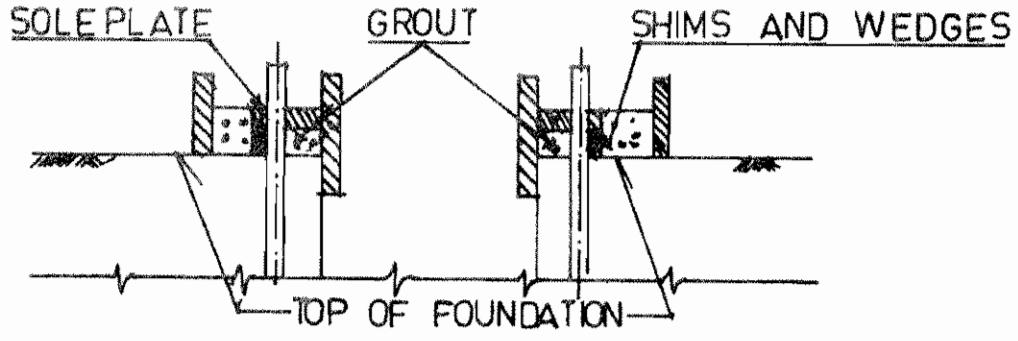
TYPICAL FOUNDATION DESIGN
